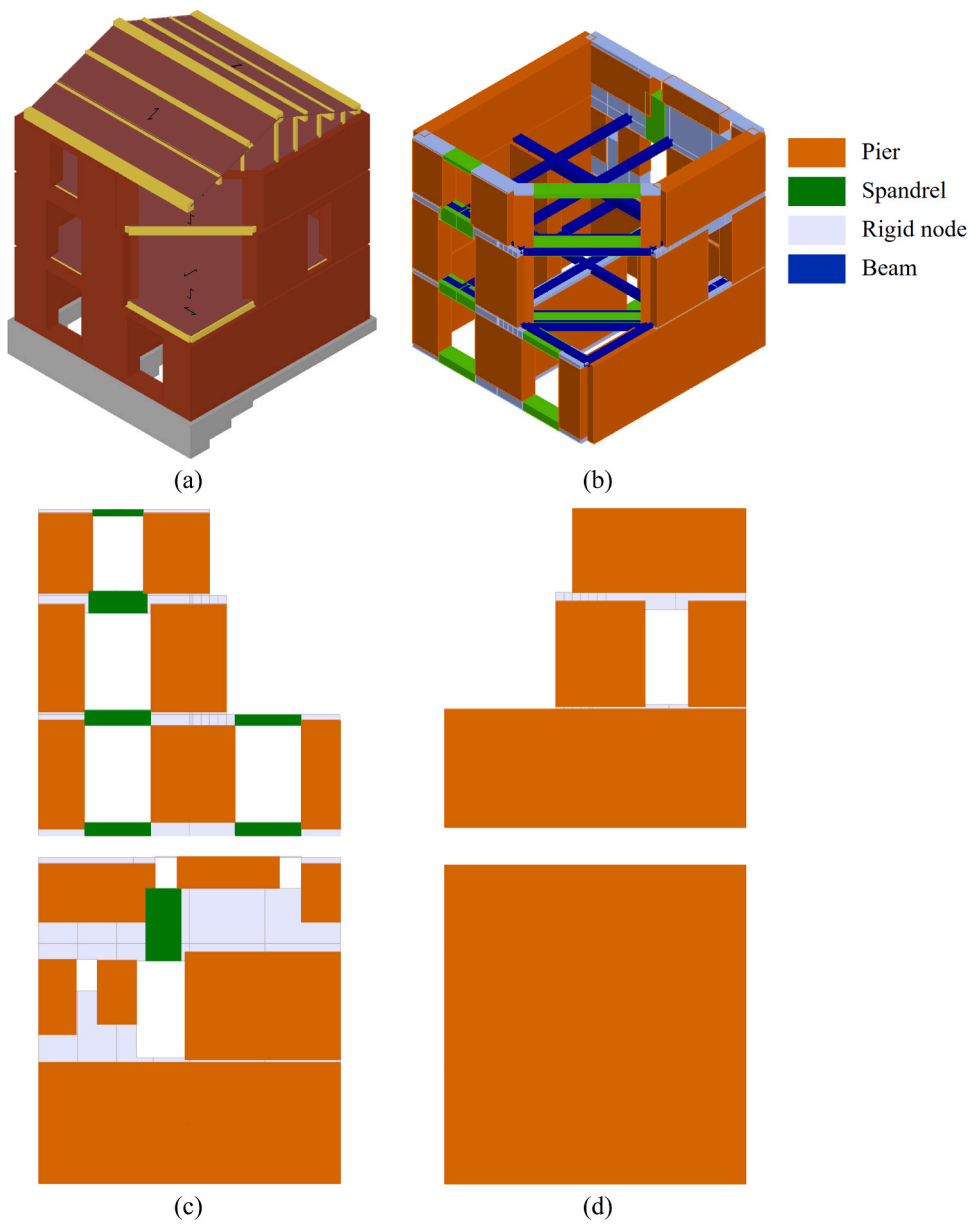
(a) 3D model of the building; (b) 3D equivalent frame model, distinguishing piers, spandrels and beams; equivalent frames of façades in x-direction (c) and y-direction (d).
